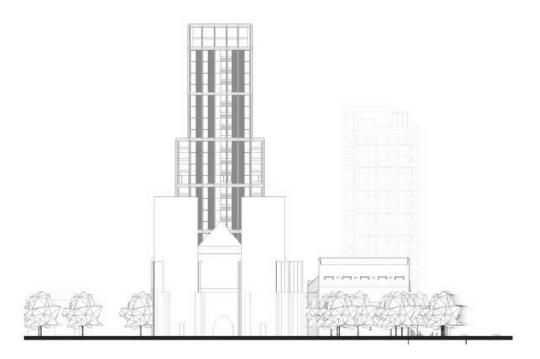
East and West Building Elevation of the proposed Cathedral Precinct development.
